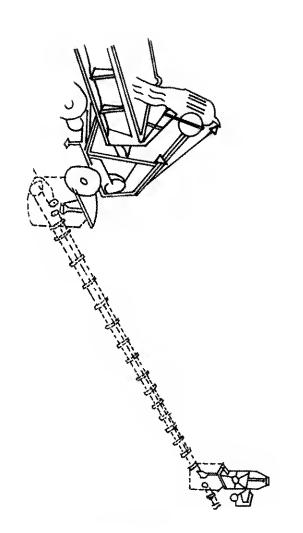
\* SEWER CLEANING BUCKET MACHINE
